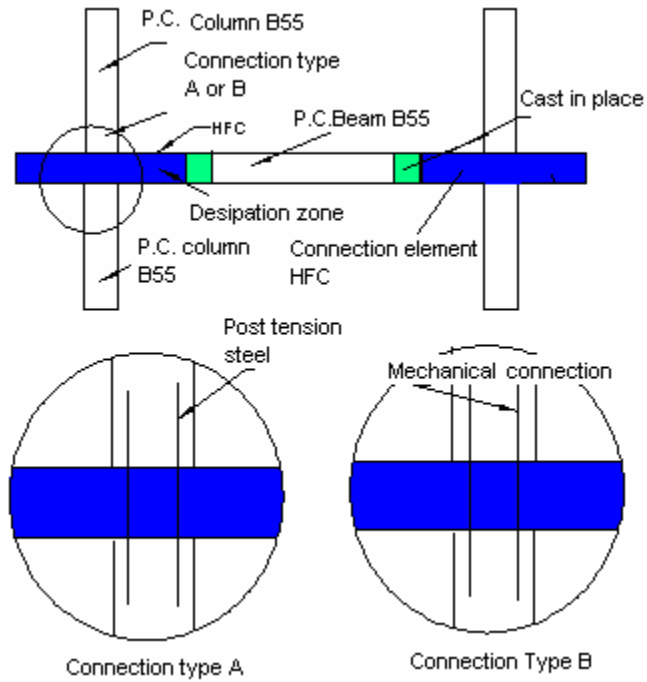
Connection type emulated monolith R/C, B55 columns and HFC beams with wet member's connection
